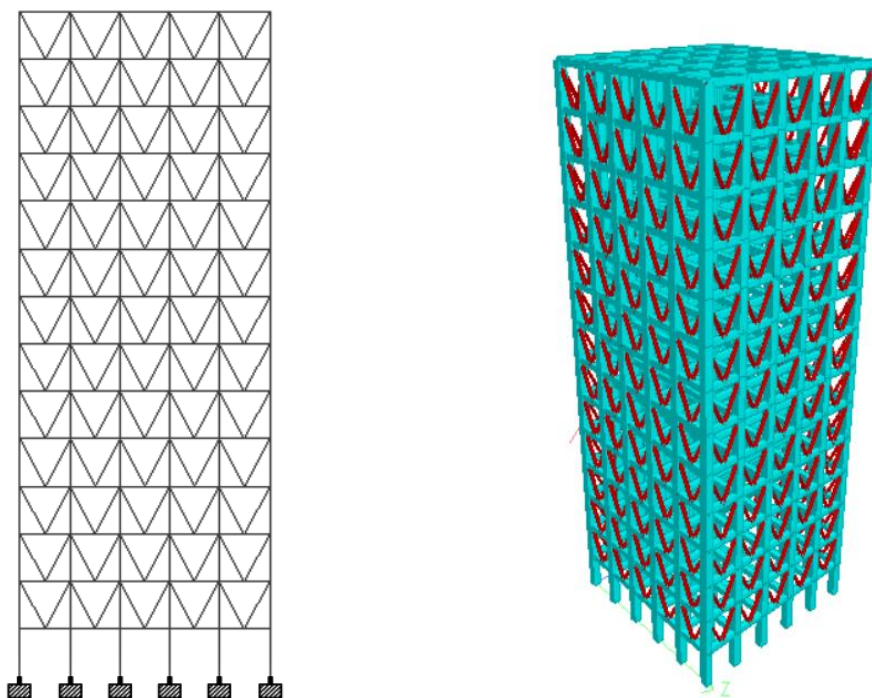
Structural Plan/Layout of RC Frame Model
